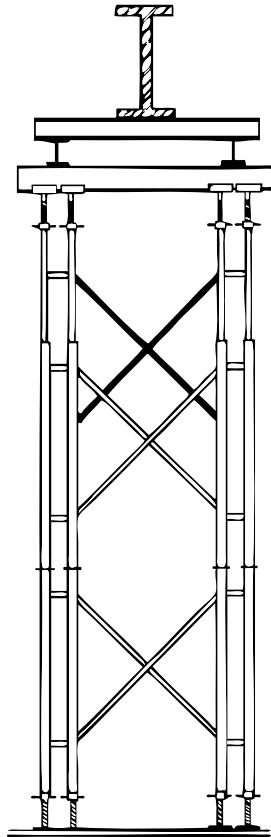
Support of existing structural members (as in renovation work). Note use of spacer bars to increase tower capacity and steel cribbing to distribute loads to all legs.
